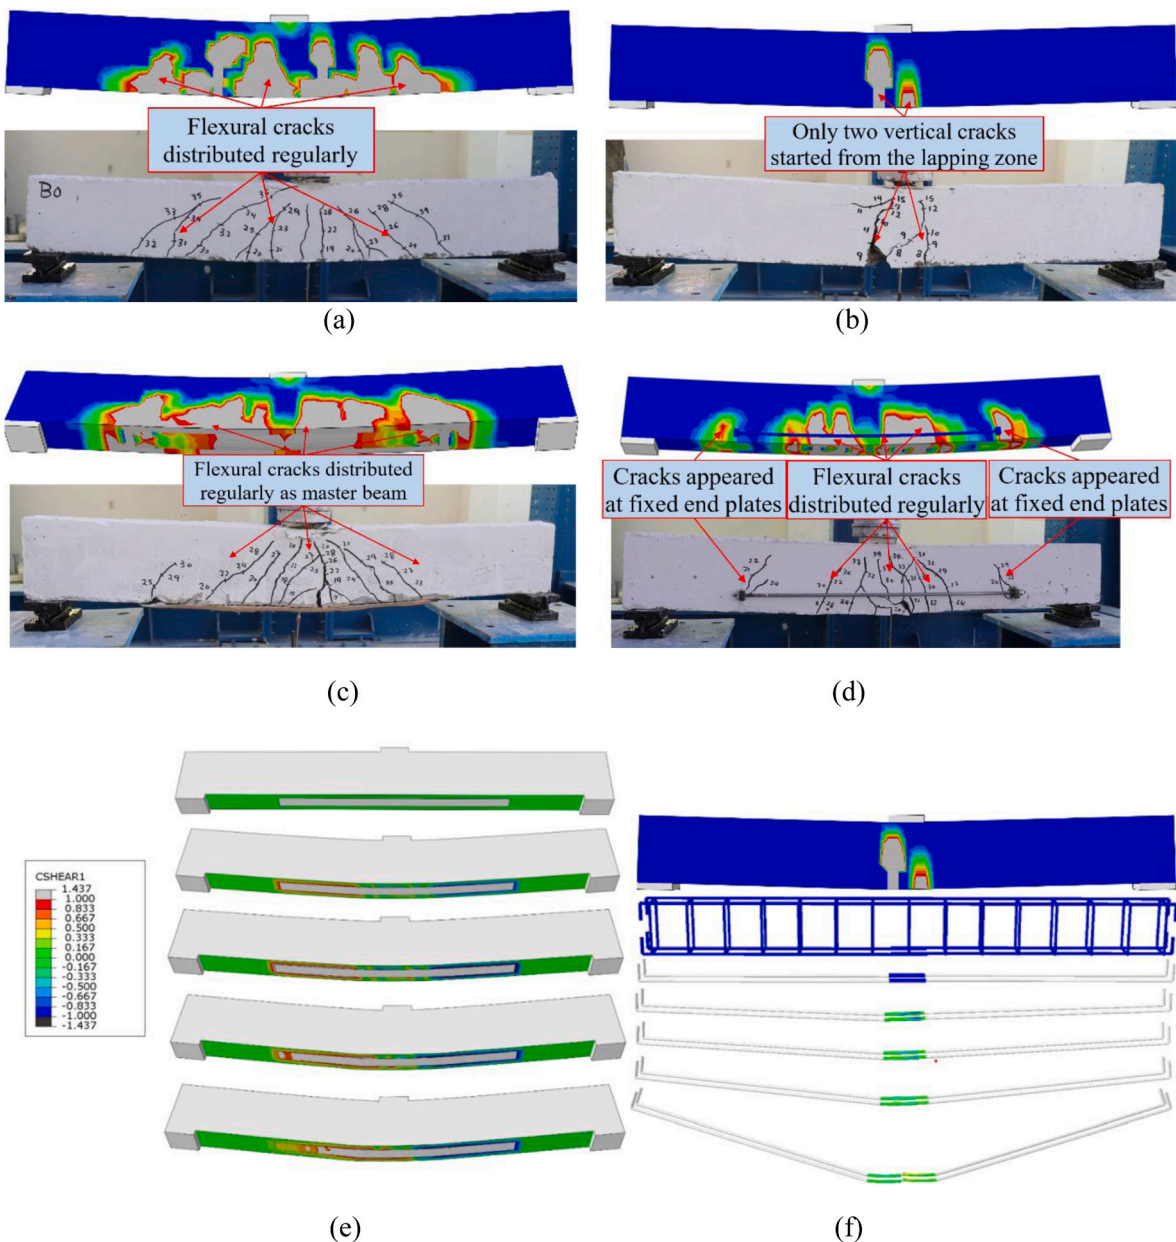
Numerical failure patterns: (a) Beam B0, (b) Beam DB, (c) Beam DB-S-40D, (D) Beam DB-Pr-40D, (e) SSSs beams, and (f) Slippage of bars in the lap splice.
